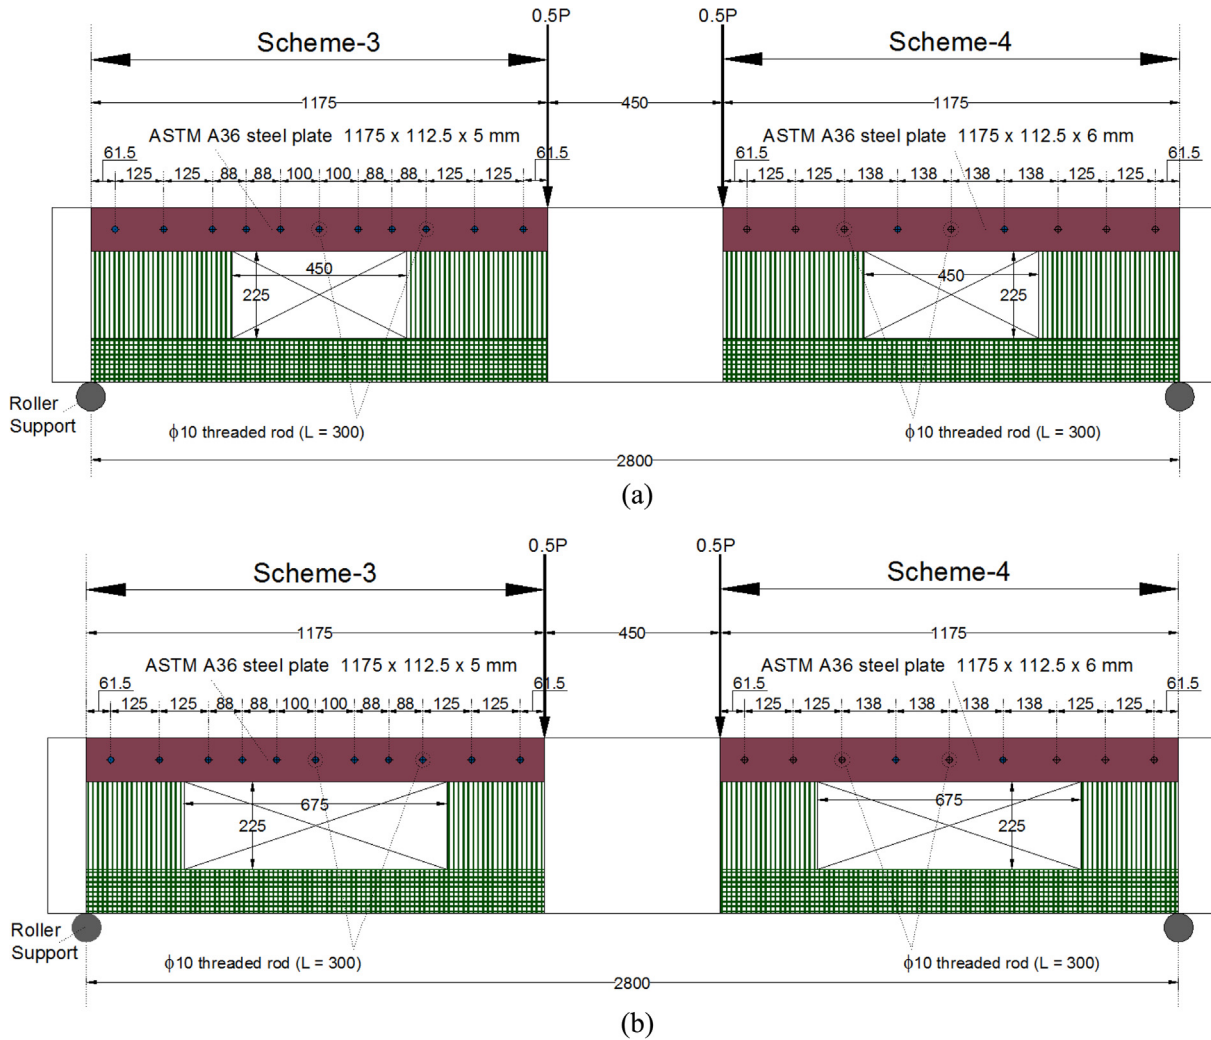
Details of proposed strengthening schemes for beams with: (a) 450 mm opening; (b) 675 mm opening (Note: All dimensions are in mm).
